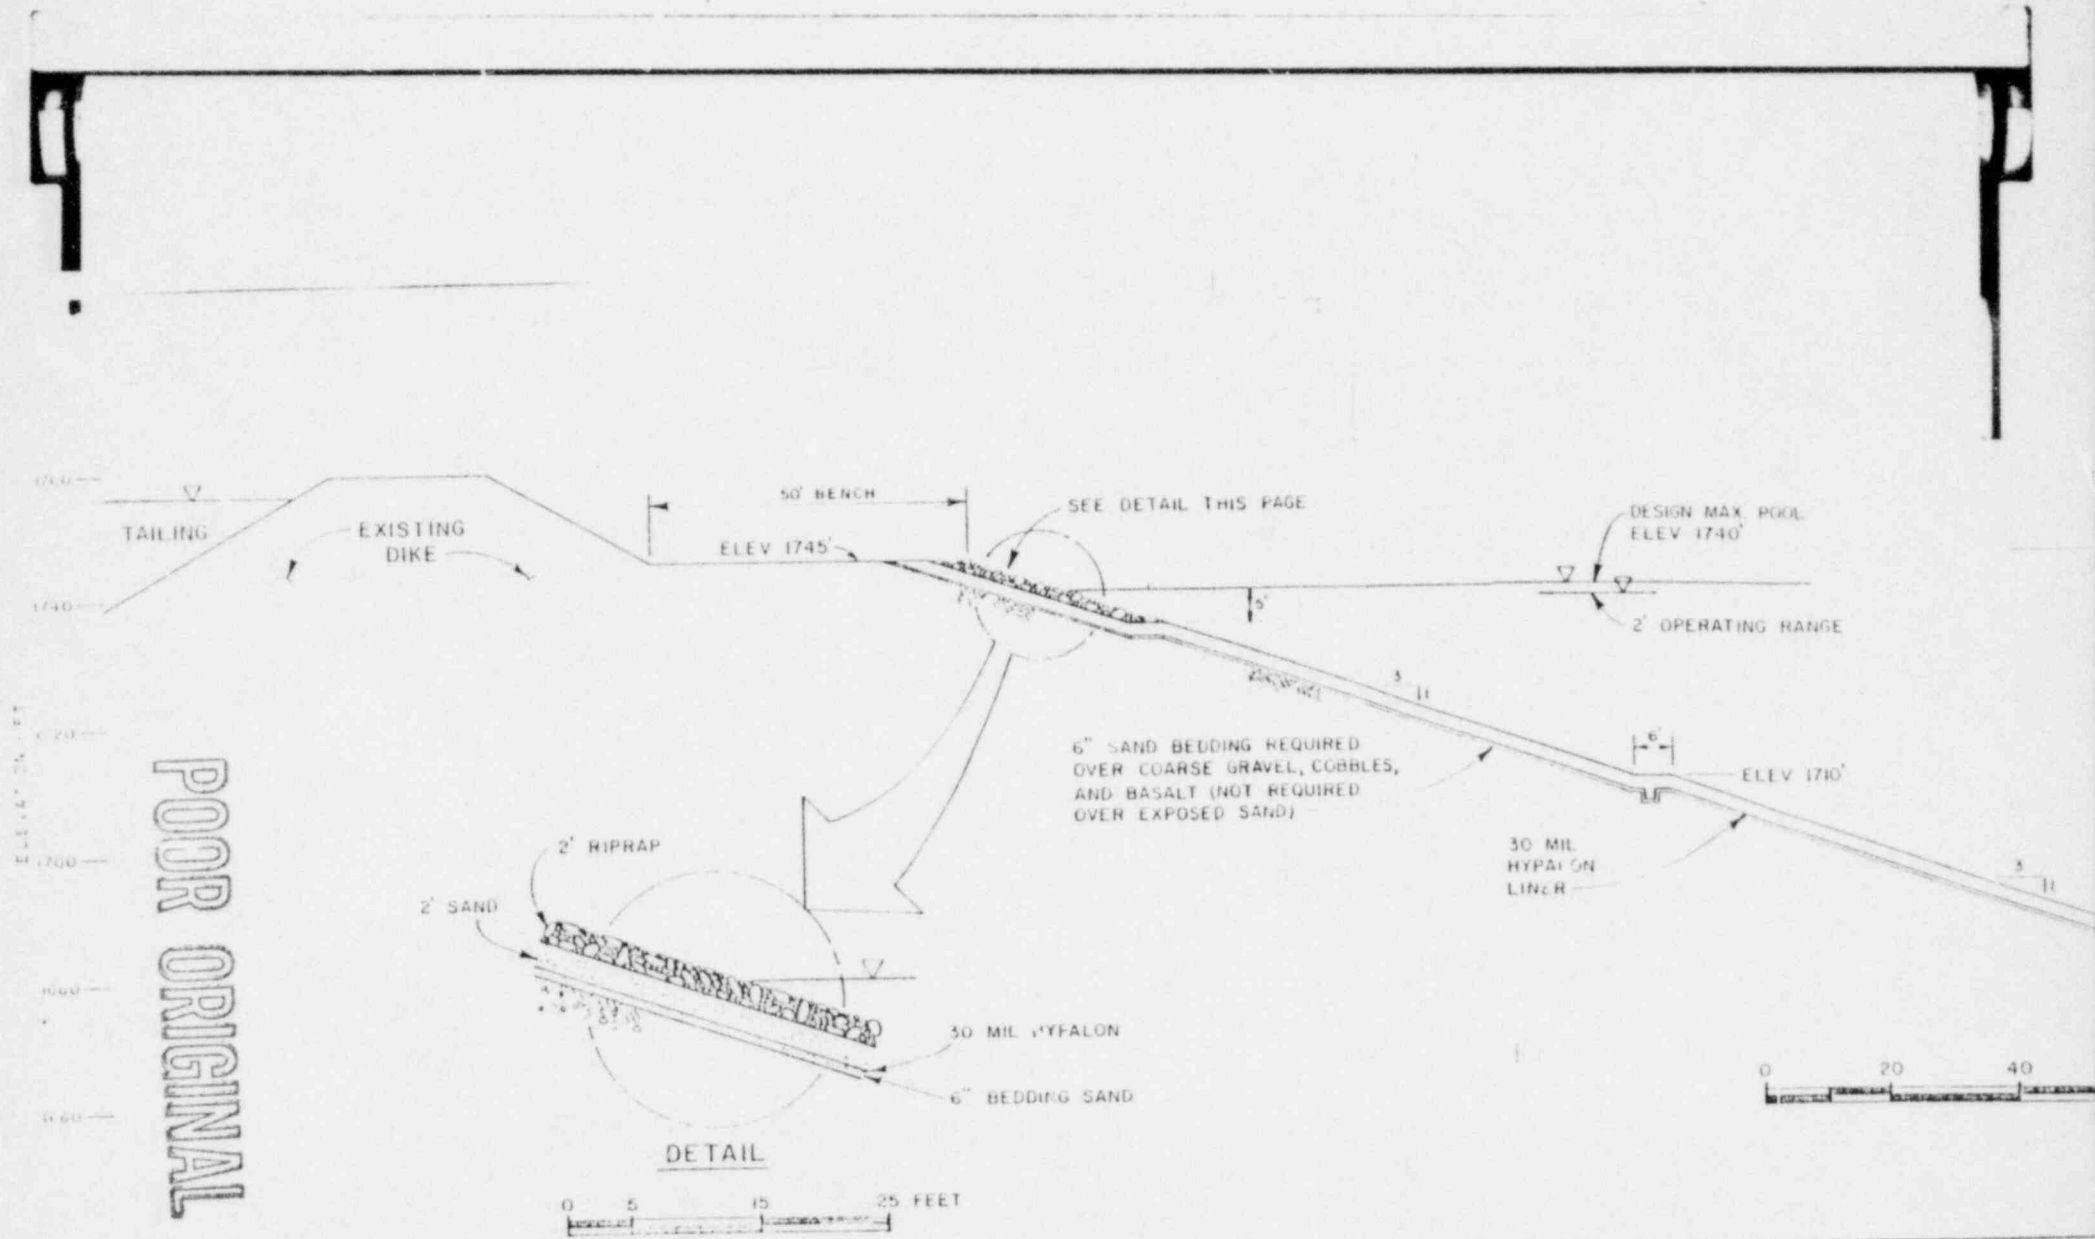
Typical Section of Pit (Source: Reference 2)
